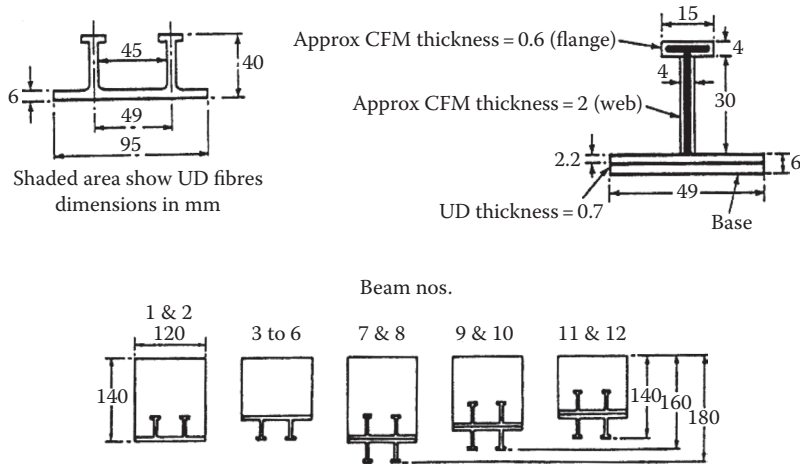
Hybrid rectangular beam cross sections. (From Hall, J.E. and Mottram, J.T., *J. Comp. Const.*, 2(2), 78, 1998.)
